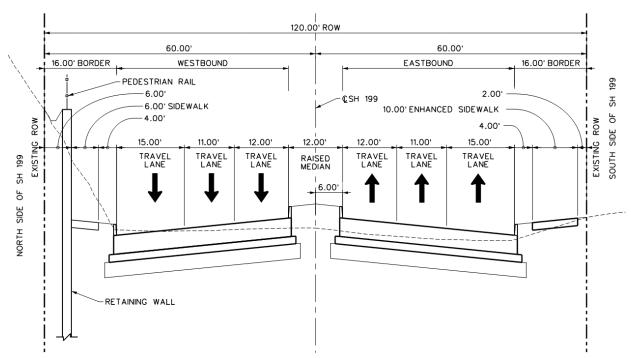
Section 3 – Extension of 16th Street to University Drive Typical Section
